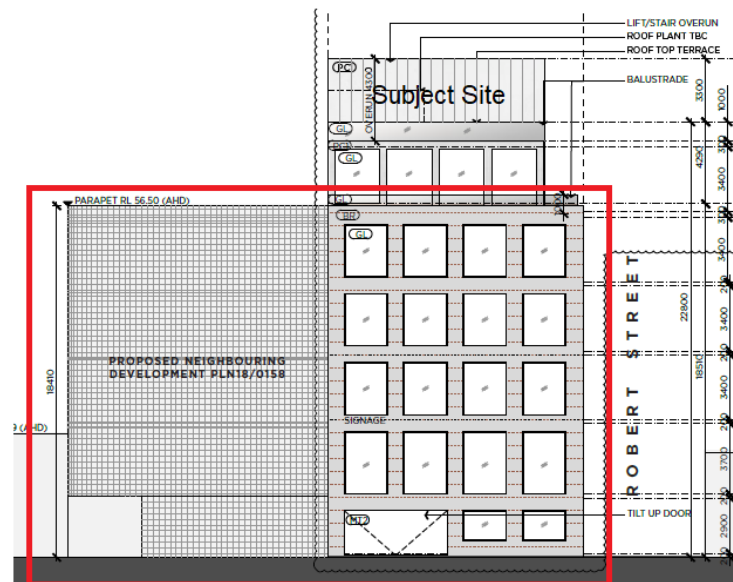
East elevation of building shown in the ‘Sketch Plans’ with the approved development to the immediate south at 89 Rokeby Street.
